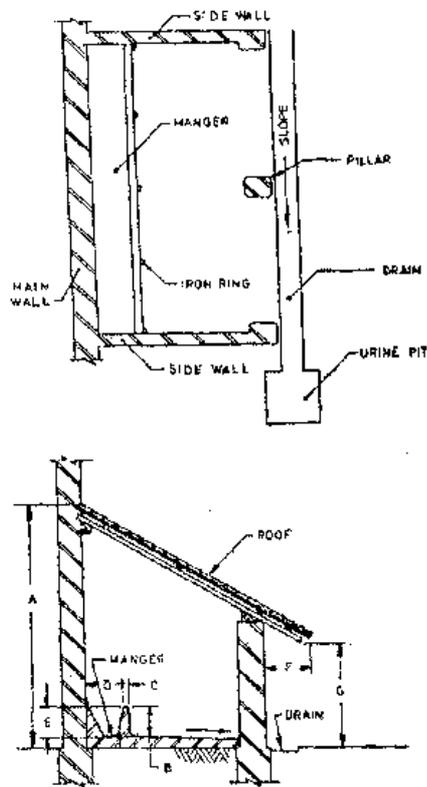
TYPICAL LAYOUT OF FARM CATTLE SHED
